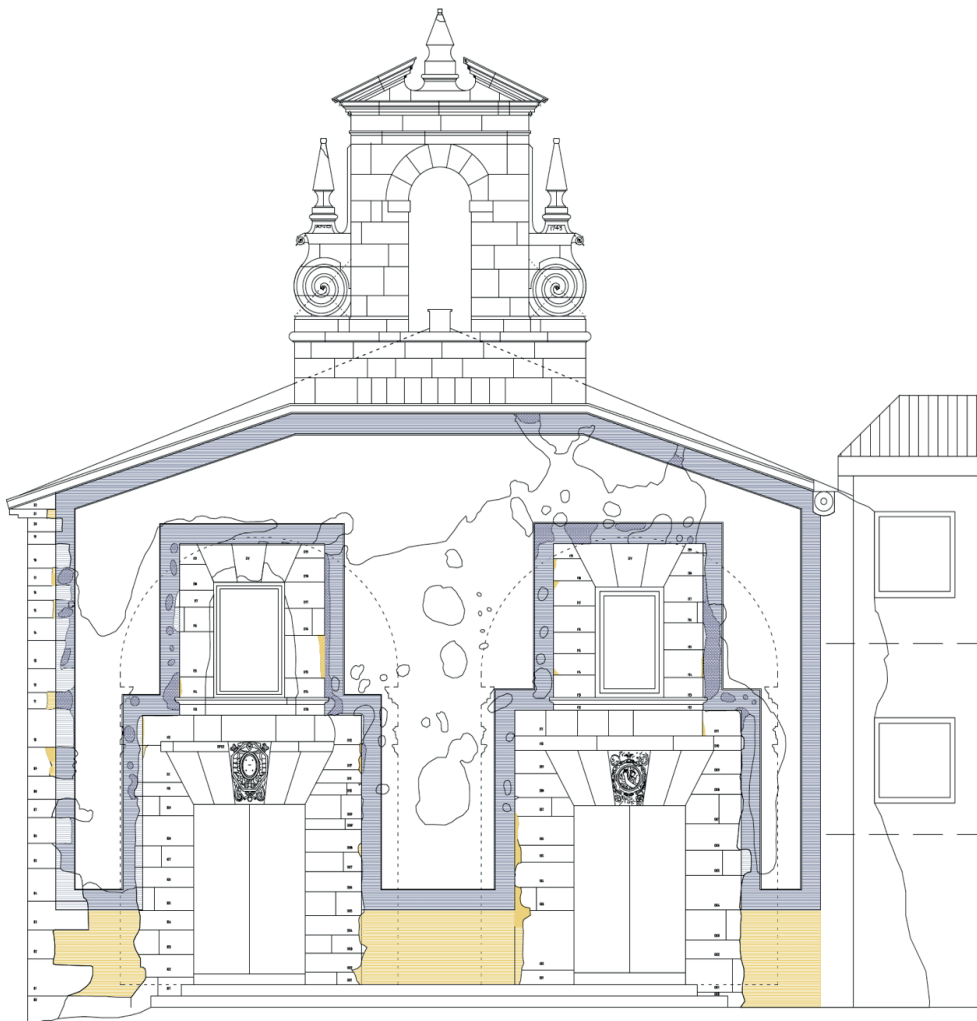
Main elevation of the church, after carrying out the planimetric survey. (Source: the authors).
